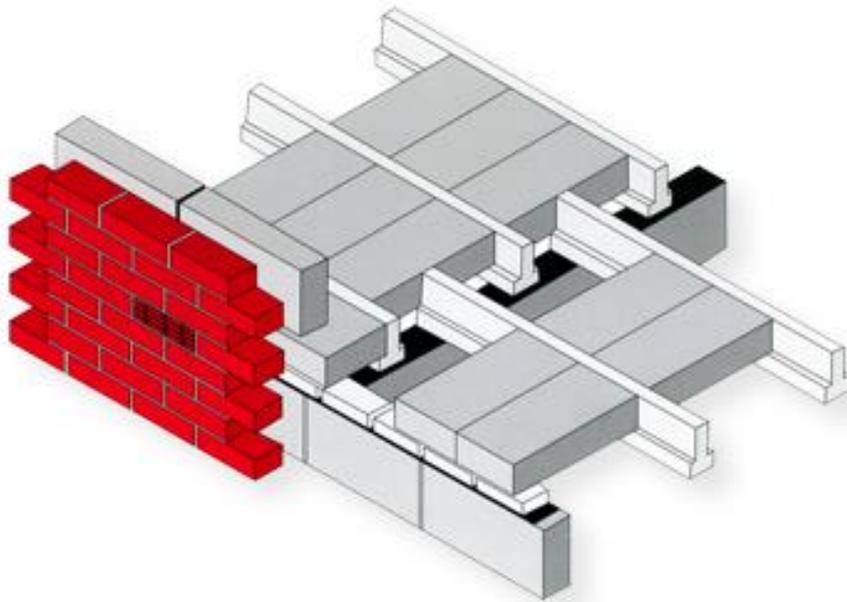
Block and Beam illustration (Litecast, 2009)
